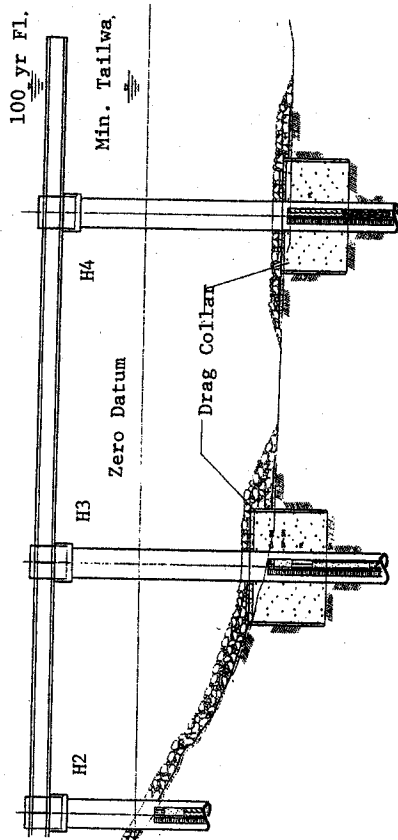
Elevation of the High Outfall Flume at Scale 1:250
